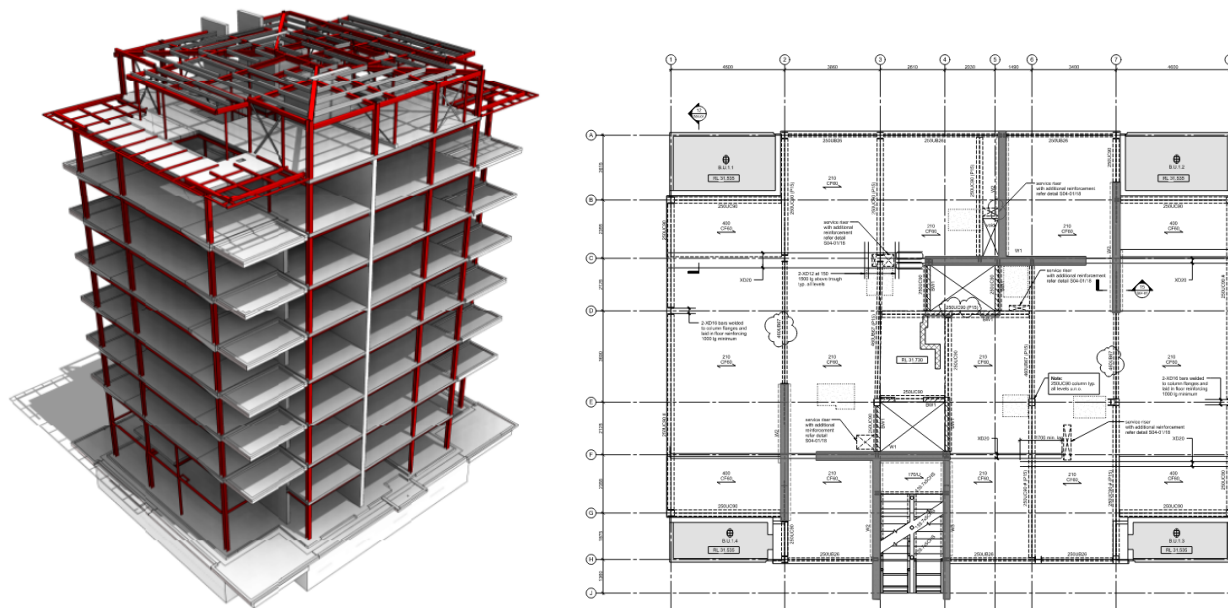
(a) 3D rendering of the apartment structure (b) typical structural framing plan.
